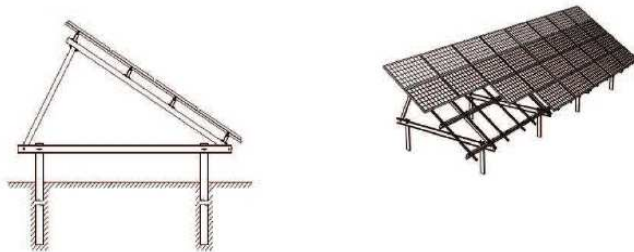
Foundation Alternatives, referred to above. Source: DSR Aurecon
